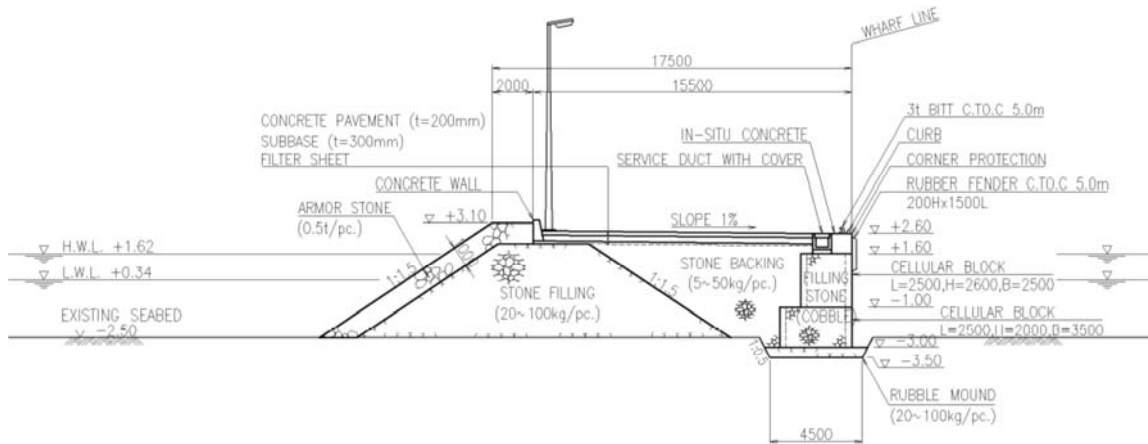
(2) Layout Plan of Civil Facilities
